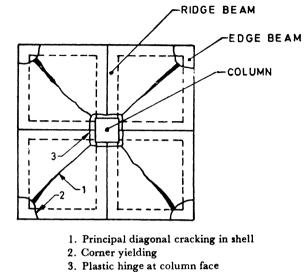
FAILURE MECHANISMS OF HYPAR FOOTING — Contd.
